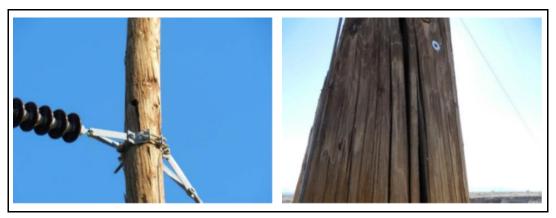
Examples of Damaged Outer Layer on Existing Structures
